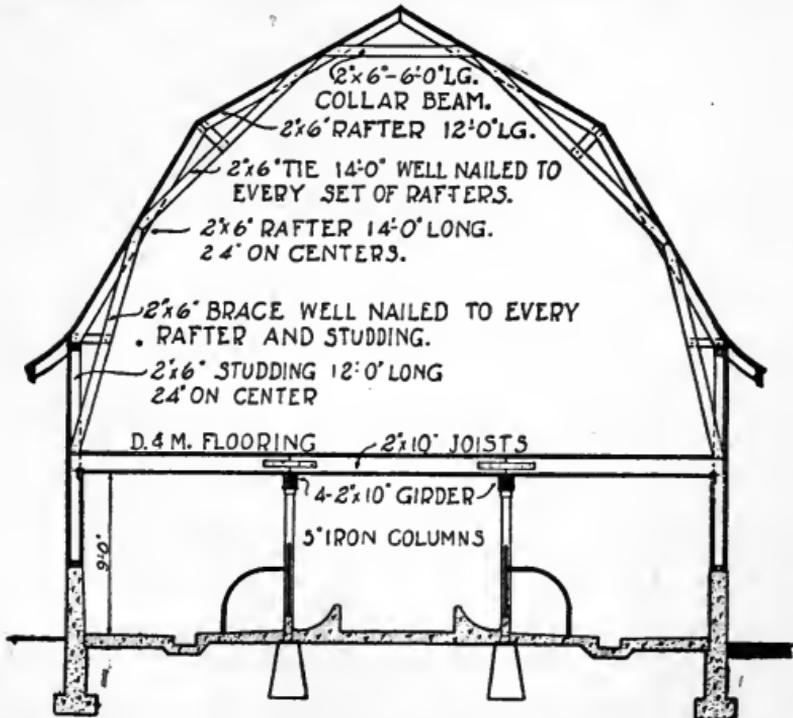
Cross Section Showing Complete Detail of Concrete Stable Floor Construction with Footings and Center Piers. Also Heavy Girders, Side Walls and Rafter Trusses.
